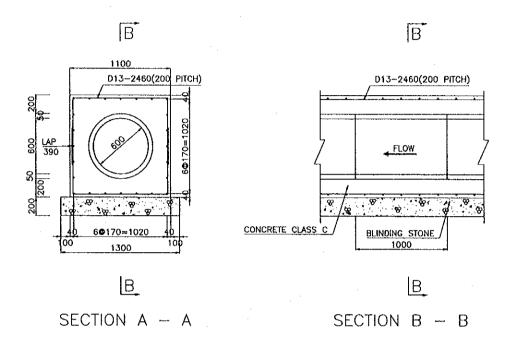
DETAIL OF DRAINAGE PIPE Ø600 SCALE = 1/40
